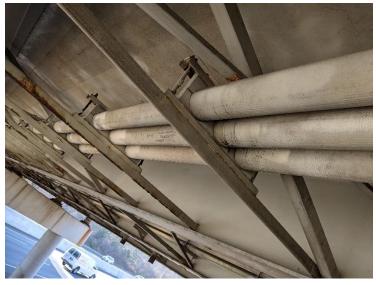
View looking at underside of structure. Bank of 3 Transite conduits are present.
